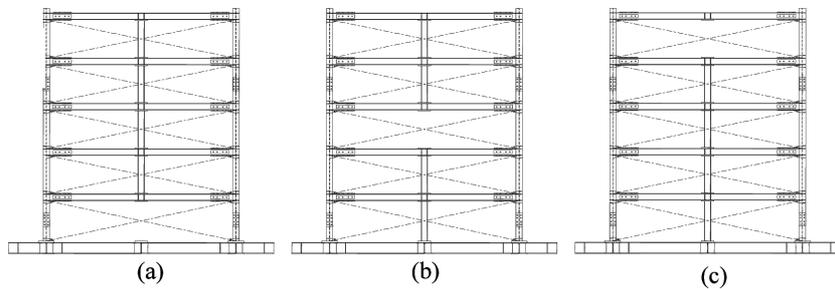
Damage case: removing central column on the (a) first, (b) third and (c) fifth floor
